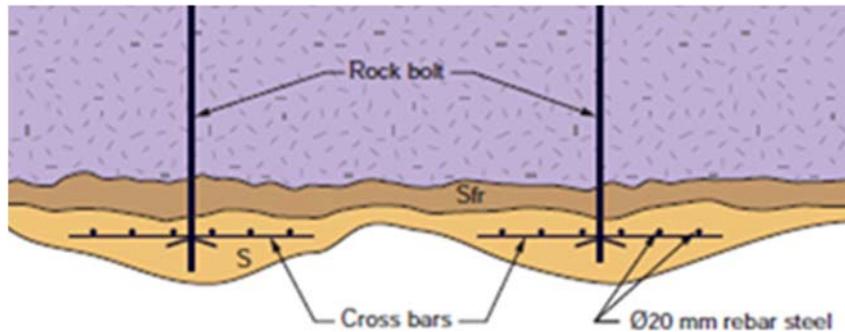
Schematic sketch of Reinforced Rib of Shotcrete.
